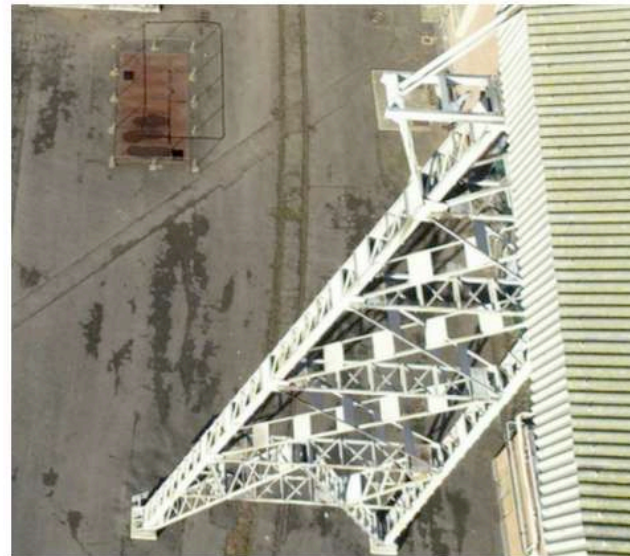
IMAGE OF STRUCTURAL STEEL SUPPORTS TO BE SAND-BLASTED AND REPAINTED
